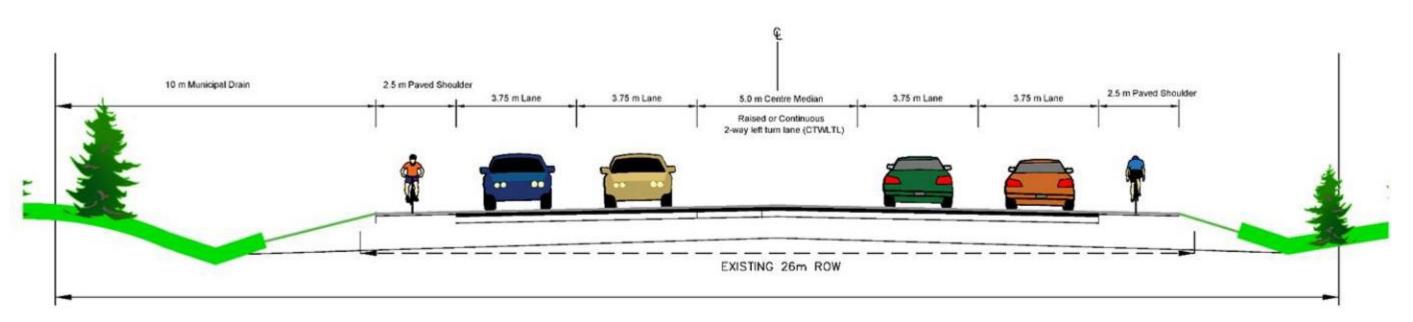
Section 3 Alternative 3 – 4-Lane Rural Cross Section
